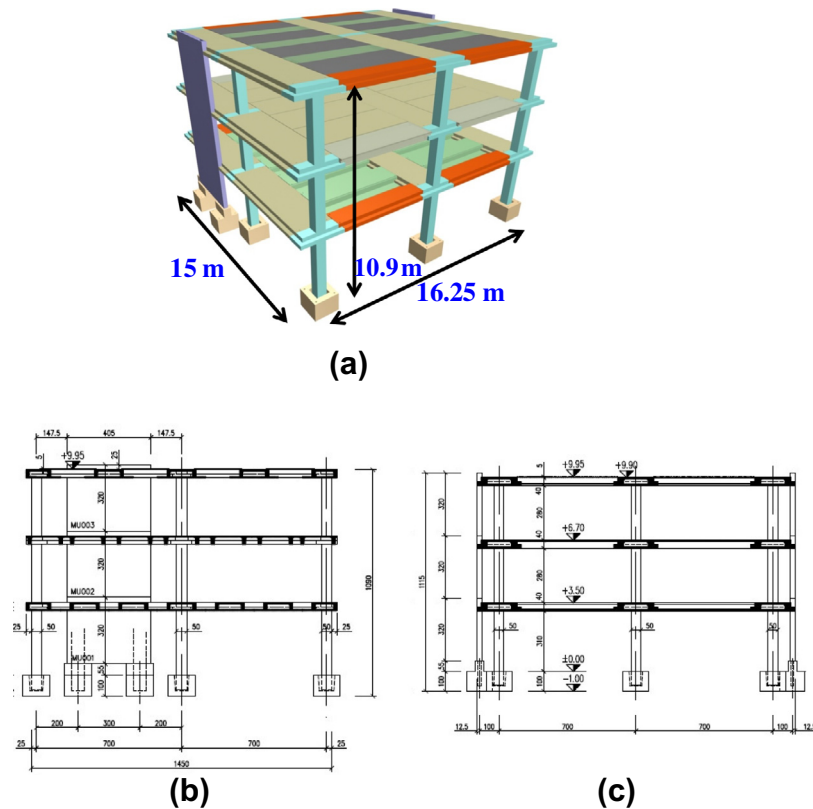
(a) Three-dimensional representation of the test structure (Dimensions in m). Section view of the test structure: (b) In the loading direction. (c) In the transverse to the loading direction (dimensions in cm).
